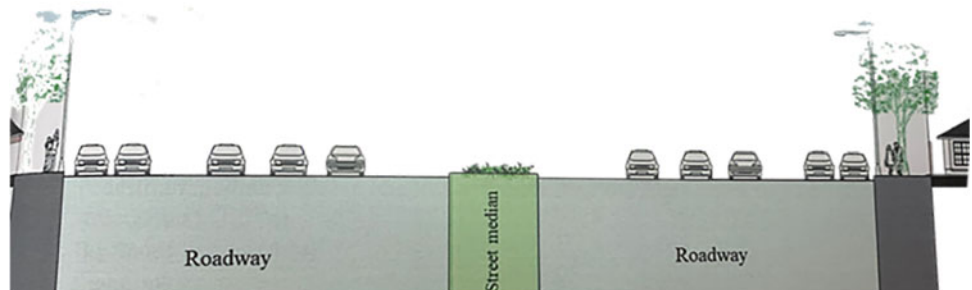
Proposed project for renovation of Hassan Mamoon street (Source The author)
